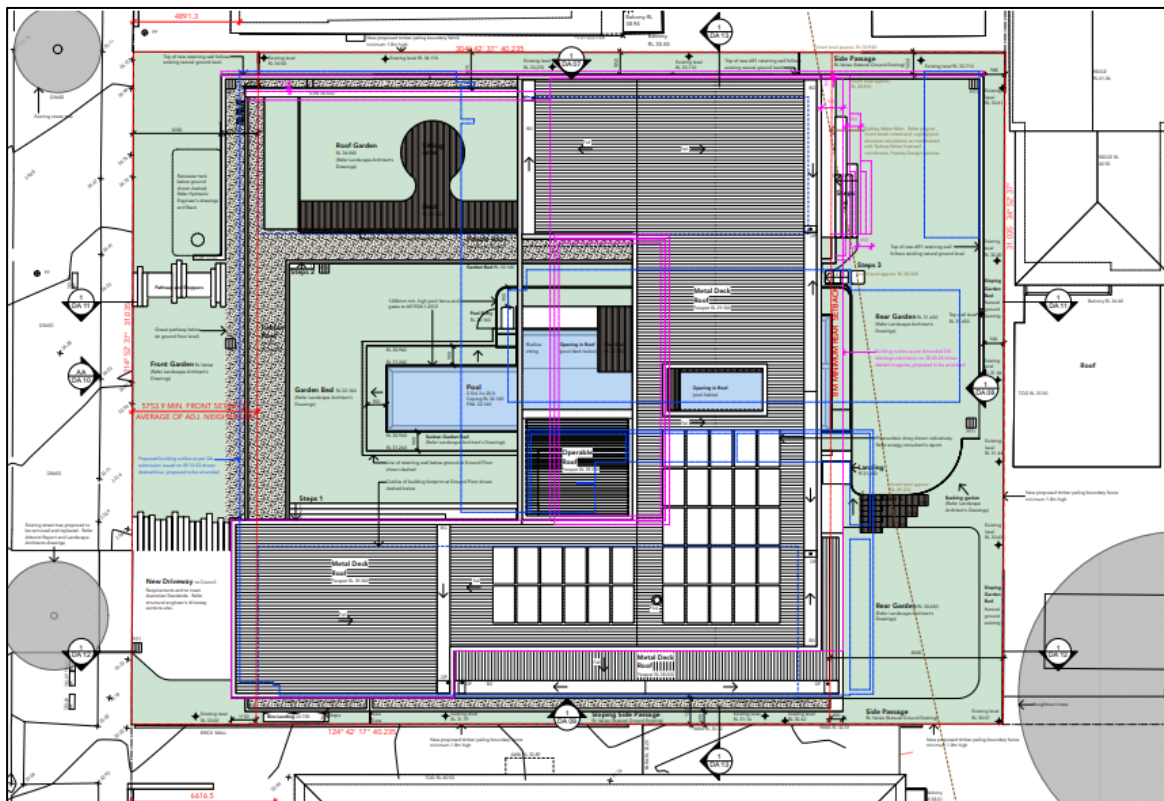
Site/ Roof Plan of subject Development – 3 - 7 Bona Vista Avenue (Source: Dominic Levene)
